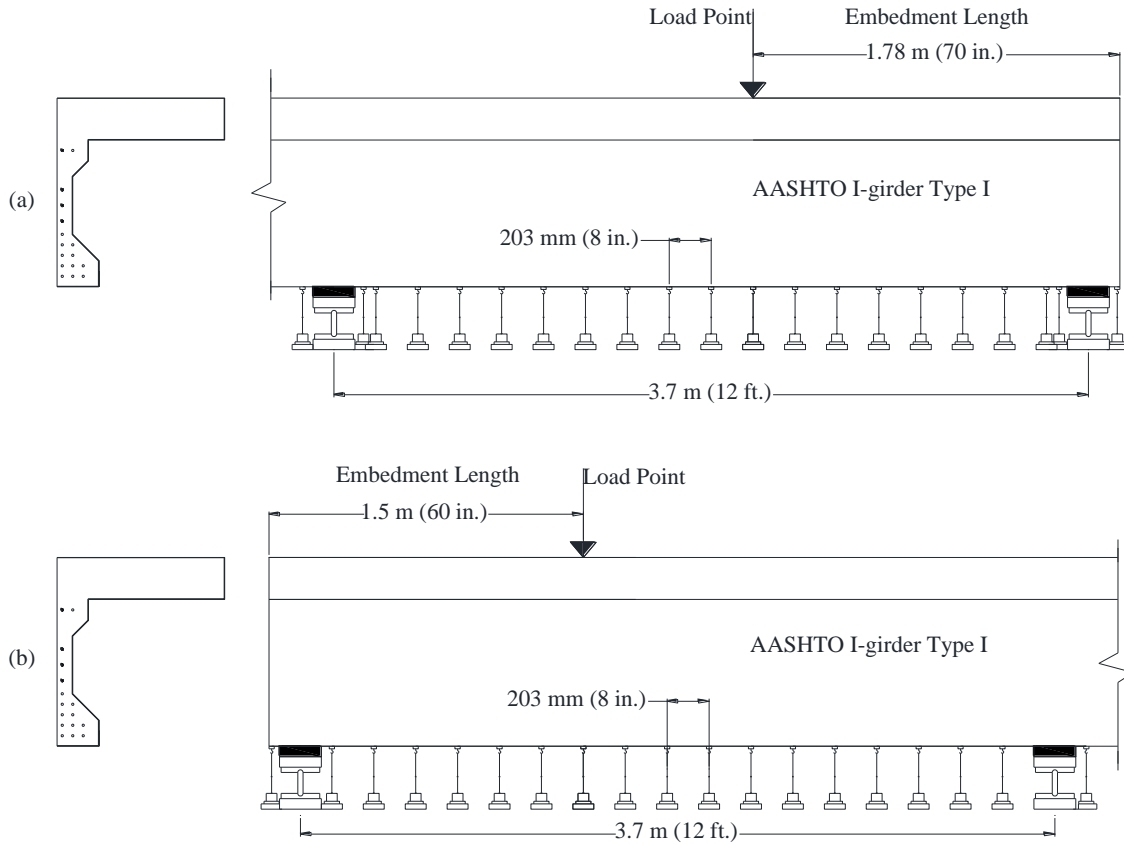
String Potentiometer Layout: (a) Shear Test 1 and (b) Shear Test
